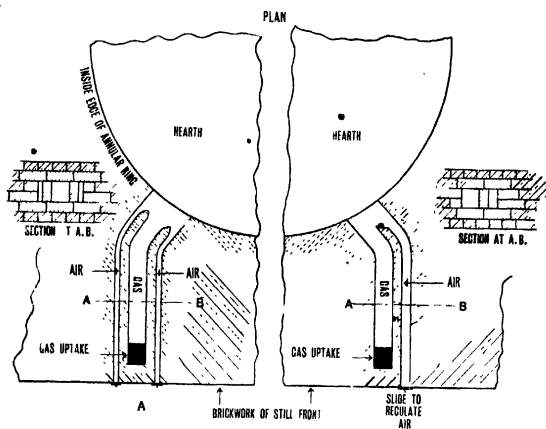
Diagrams A and B showing, in Plan, Two Methods of building a Producer Gas Burner of Brick.
